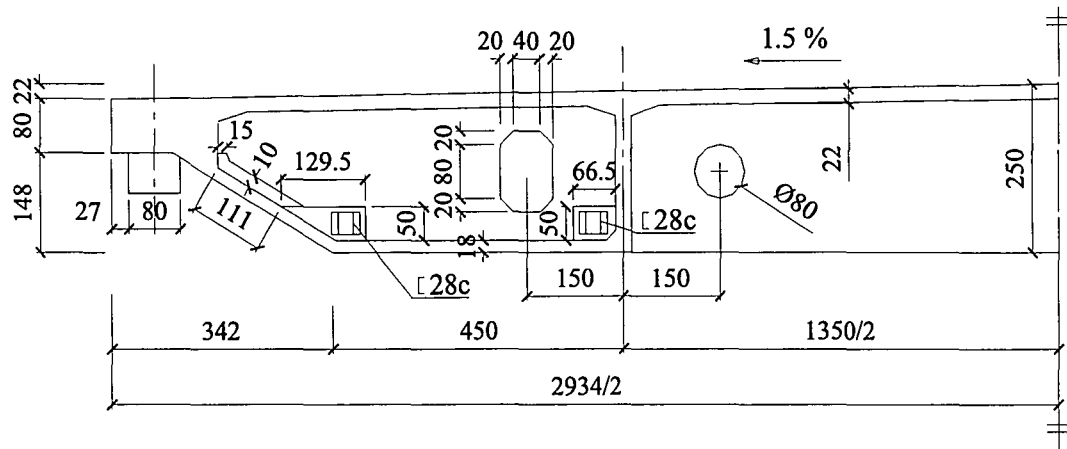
Cross-section of strengthened deck portion (Unit: cm)
